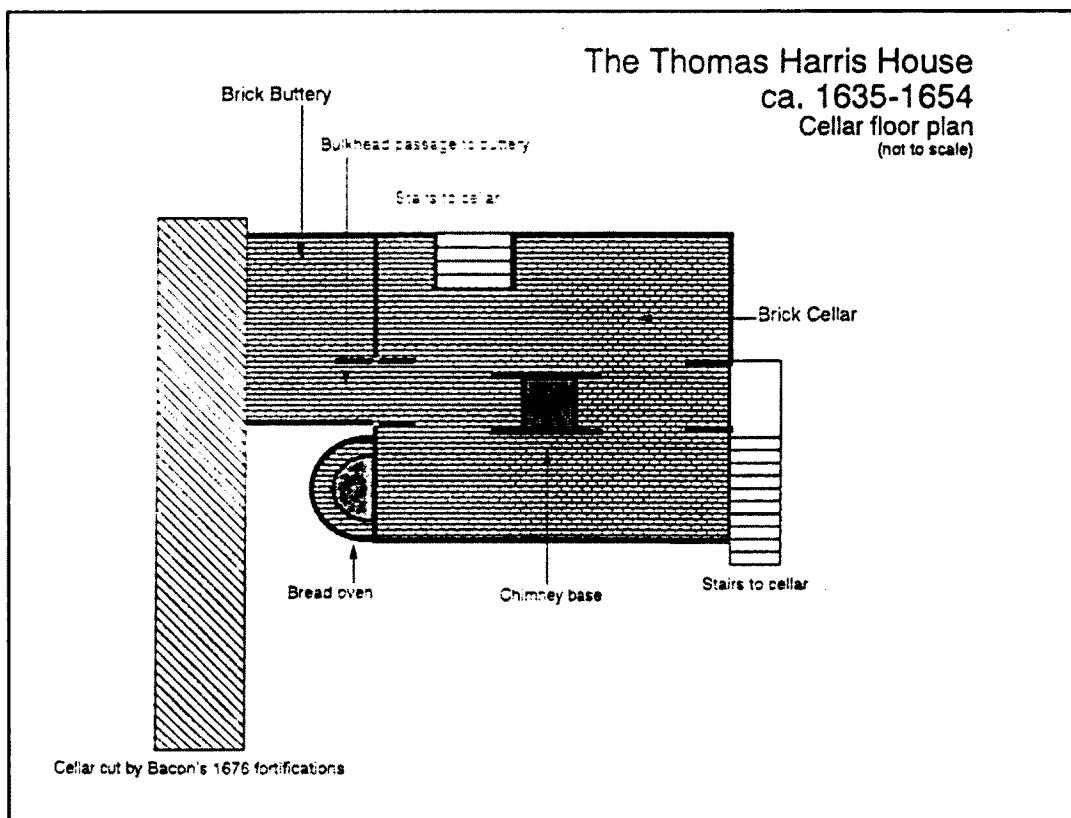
Curles Neck Harris House cellar floor plan (Mouer 1994:2).
